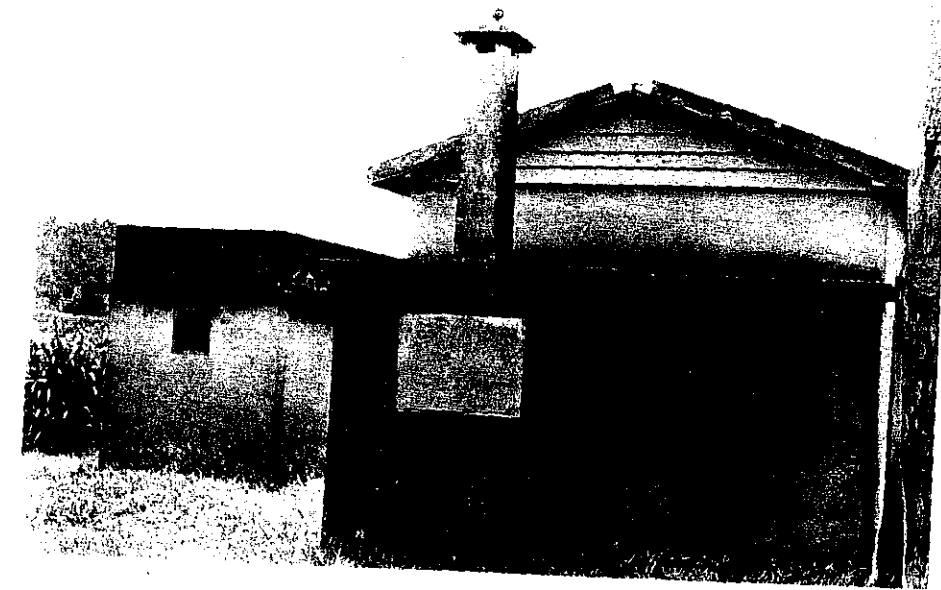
Rungert concrete barrack (constructed pre-1955): stove recess
